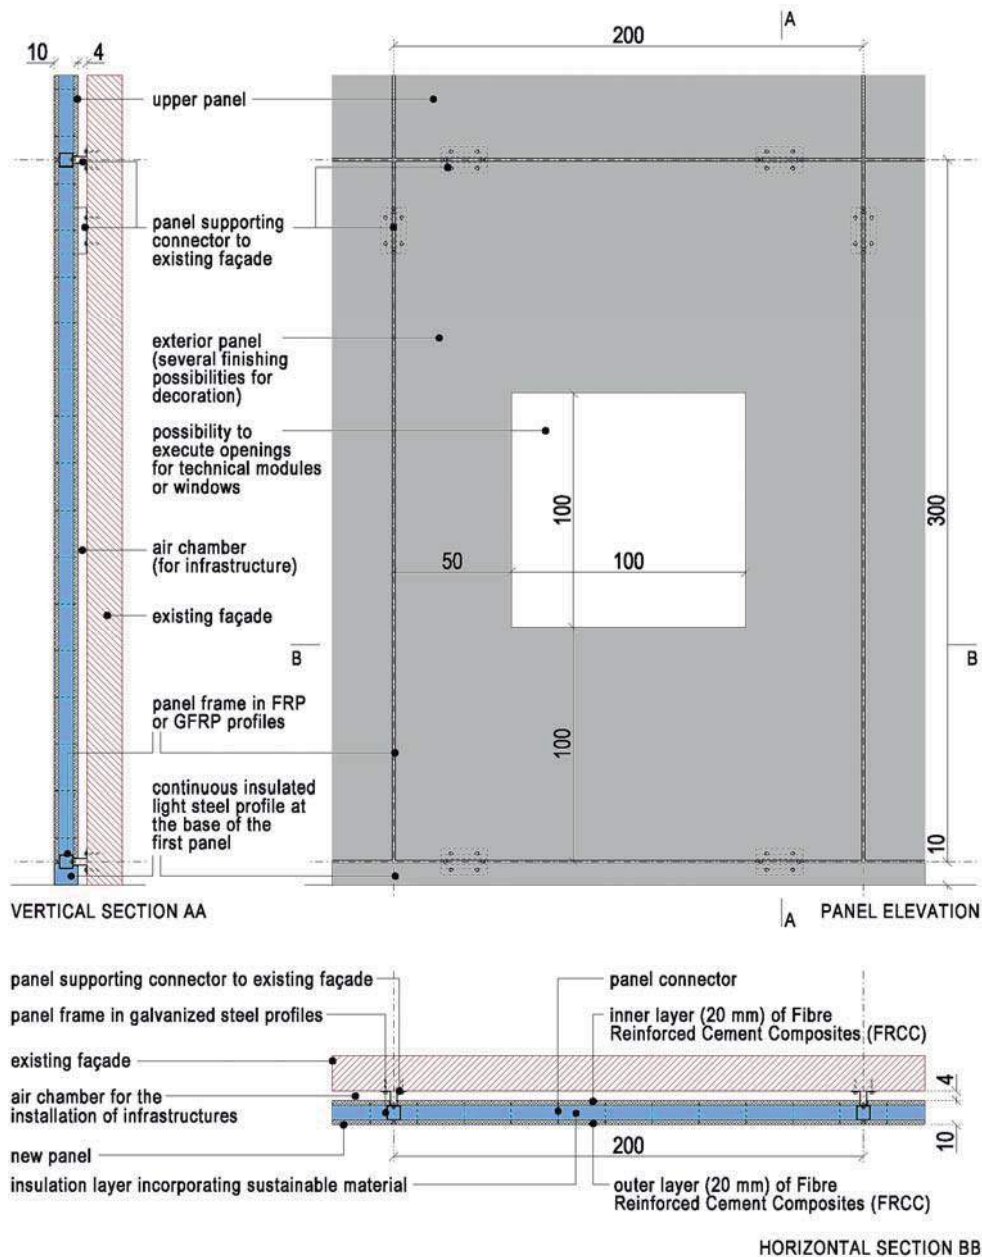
Proposed layout for the panel, including openings for technical modules (dimensions in cm)
